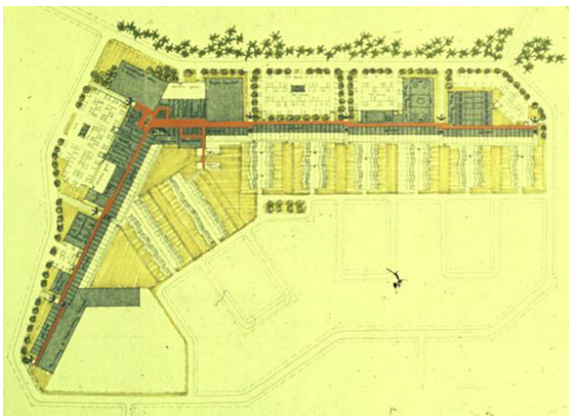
Plan of The Wall (Drawing by A. Sheppard, 1970) *Fig. 4.8. The Wall in Fermont (Photo by Maden Worries)
